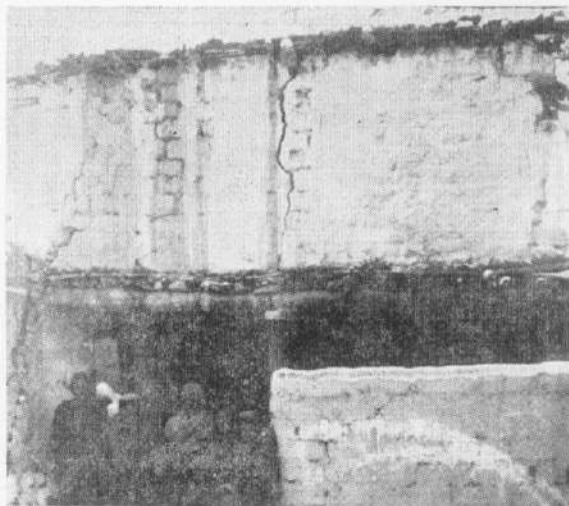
Extensive cracks in mud brick masonry on second storey resting on timber posts, with partial collapse of back walls at Chango village.
